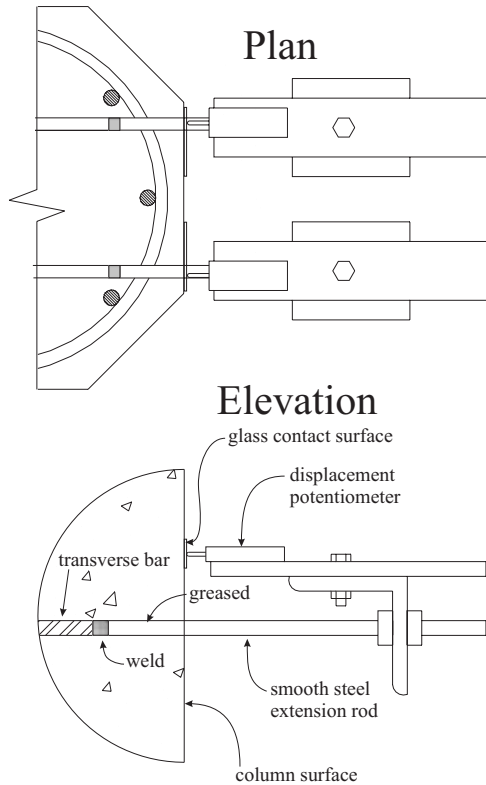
Plan and elevation of transverse bars slippage instrumentation.
